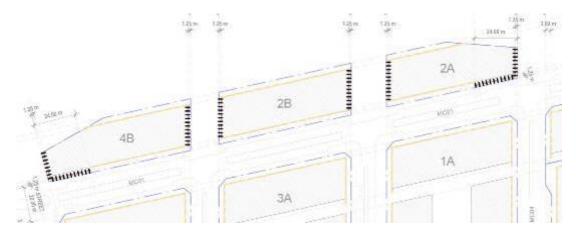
The hatching shows where buildings are proposed to maintain the 1.25m lower level setback only and not be set back 3m.
